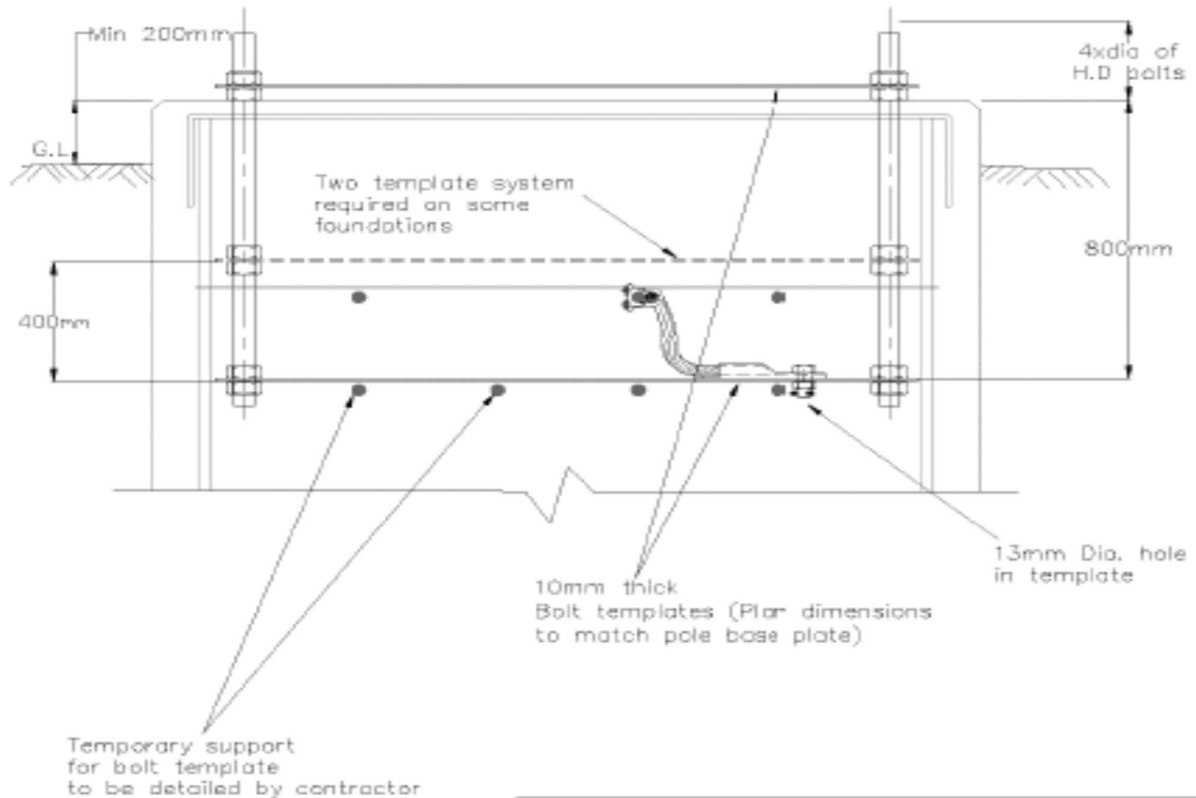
Earthing Arrangements for Straight HD Bolts
